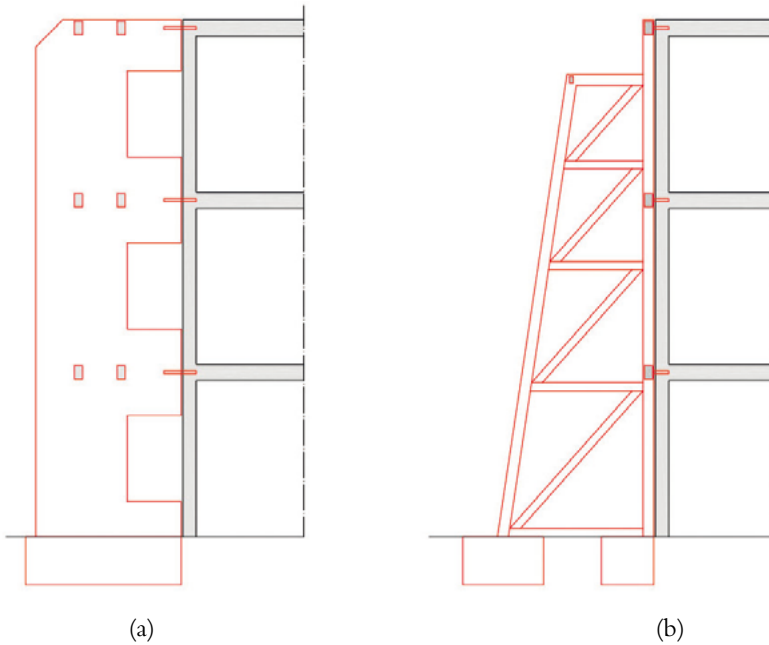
Stiffening systems using buttresses: a) Reinforced concrete;
